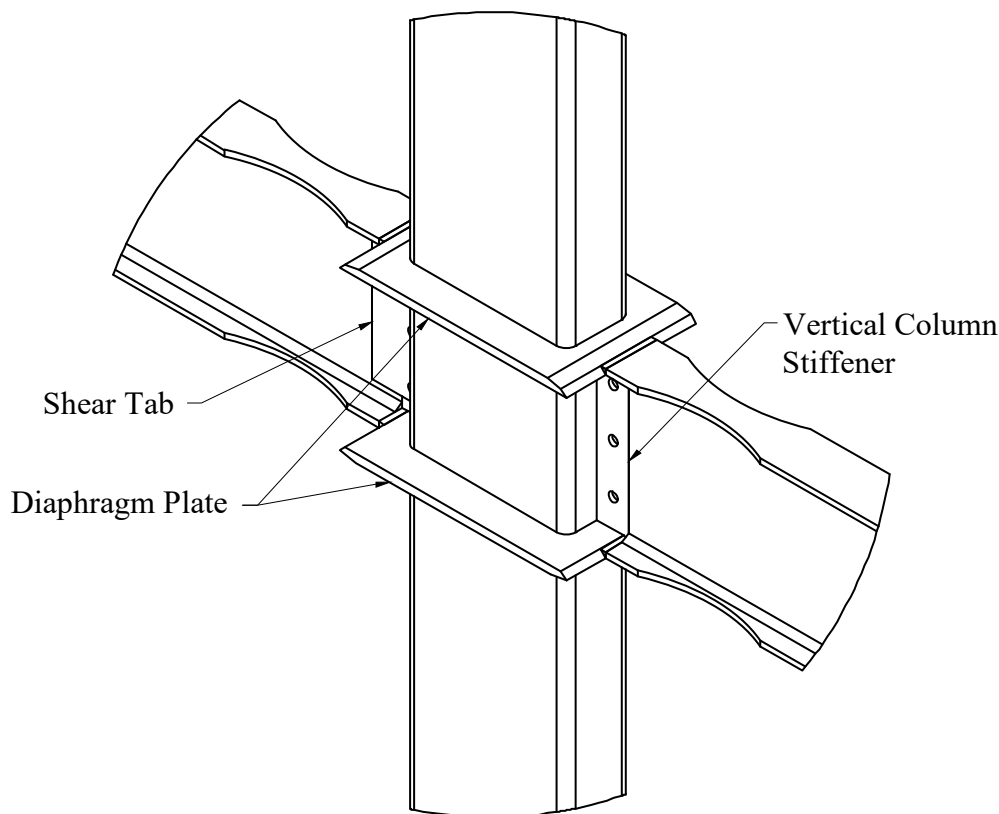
HSS column-to-wide flange beam RBS diaphragm moment connection details
